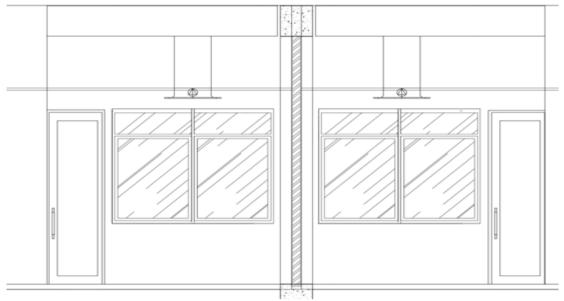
Section 2, view of ventilation, openings, and exhaust fan which is placed facing the pavilion corridor
